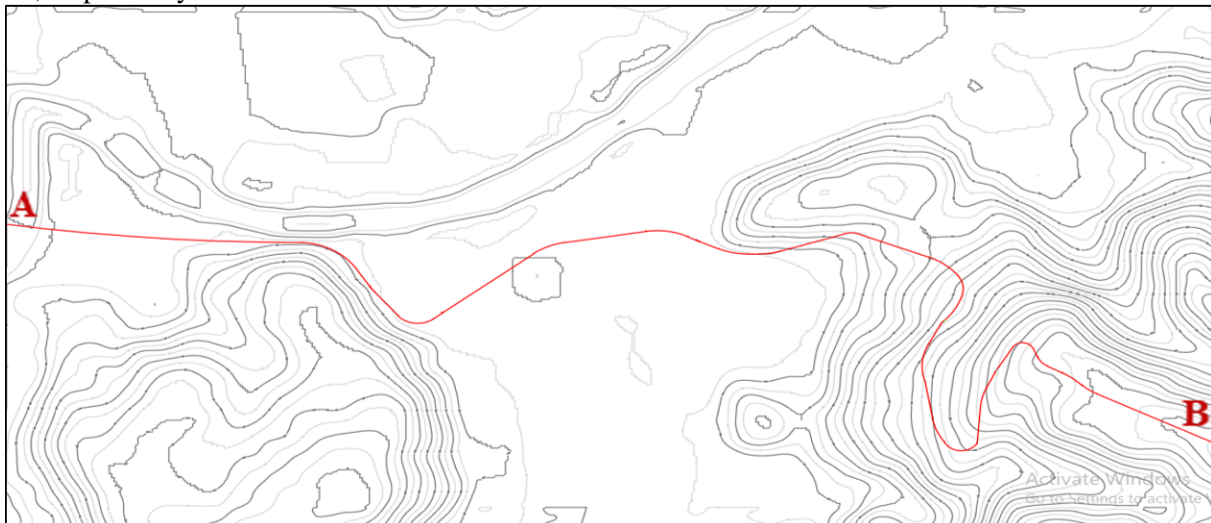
Existing road trajectories of Siluk-Panggang Road Section from STA 0+000 (Point A) to STA 3+334.7 (Point B)
